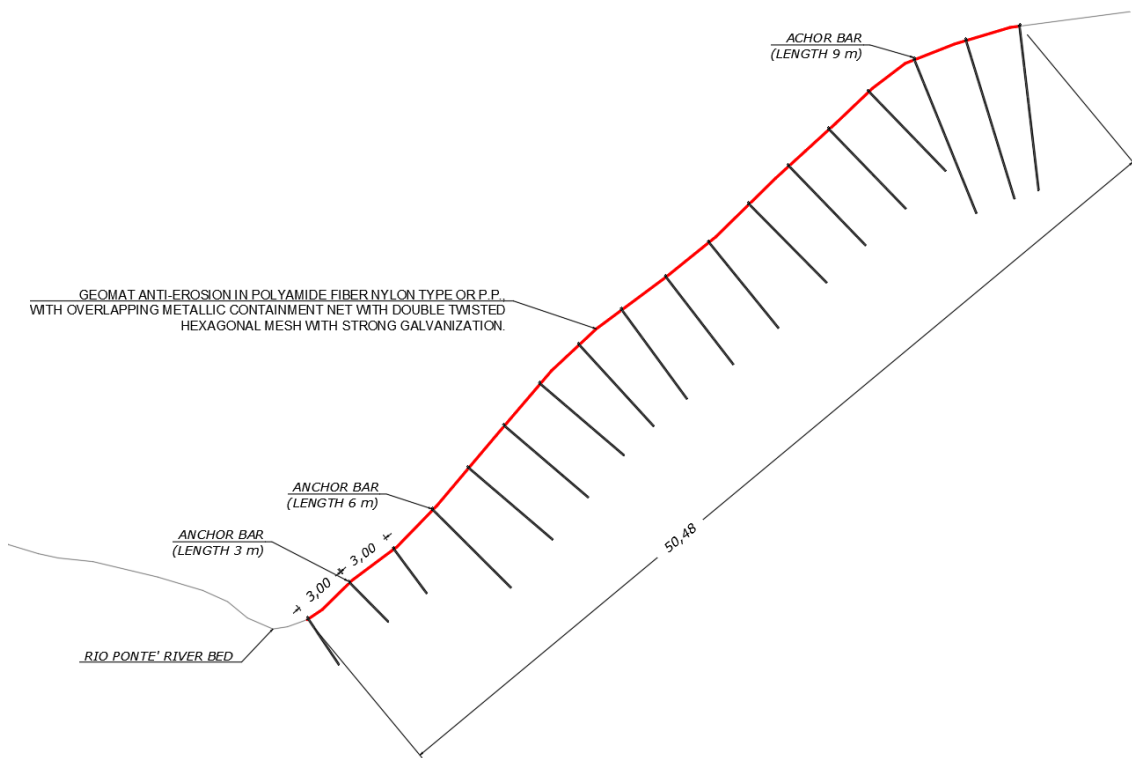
Profile view section B, B'. GEOMAT abutment B.
